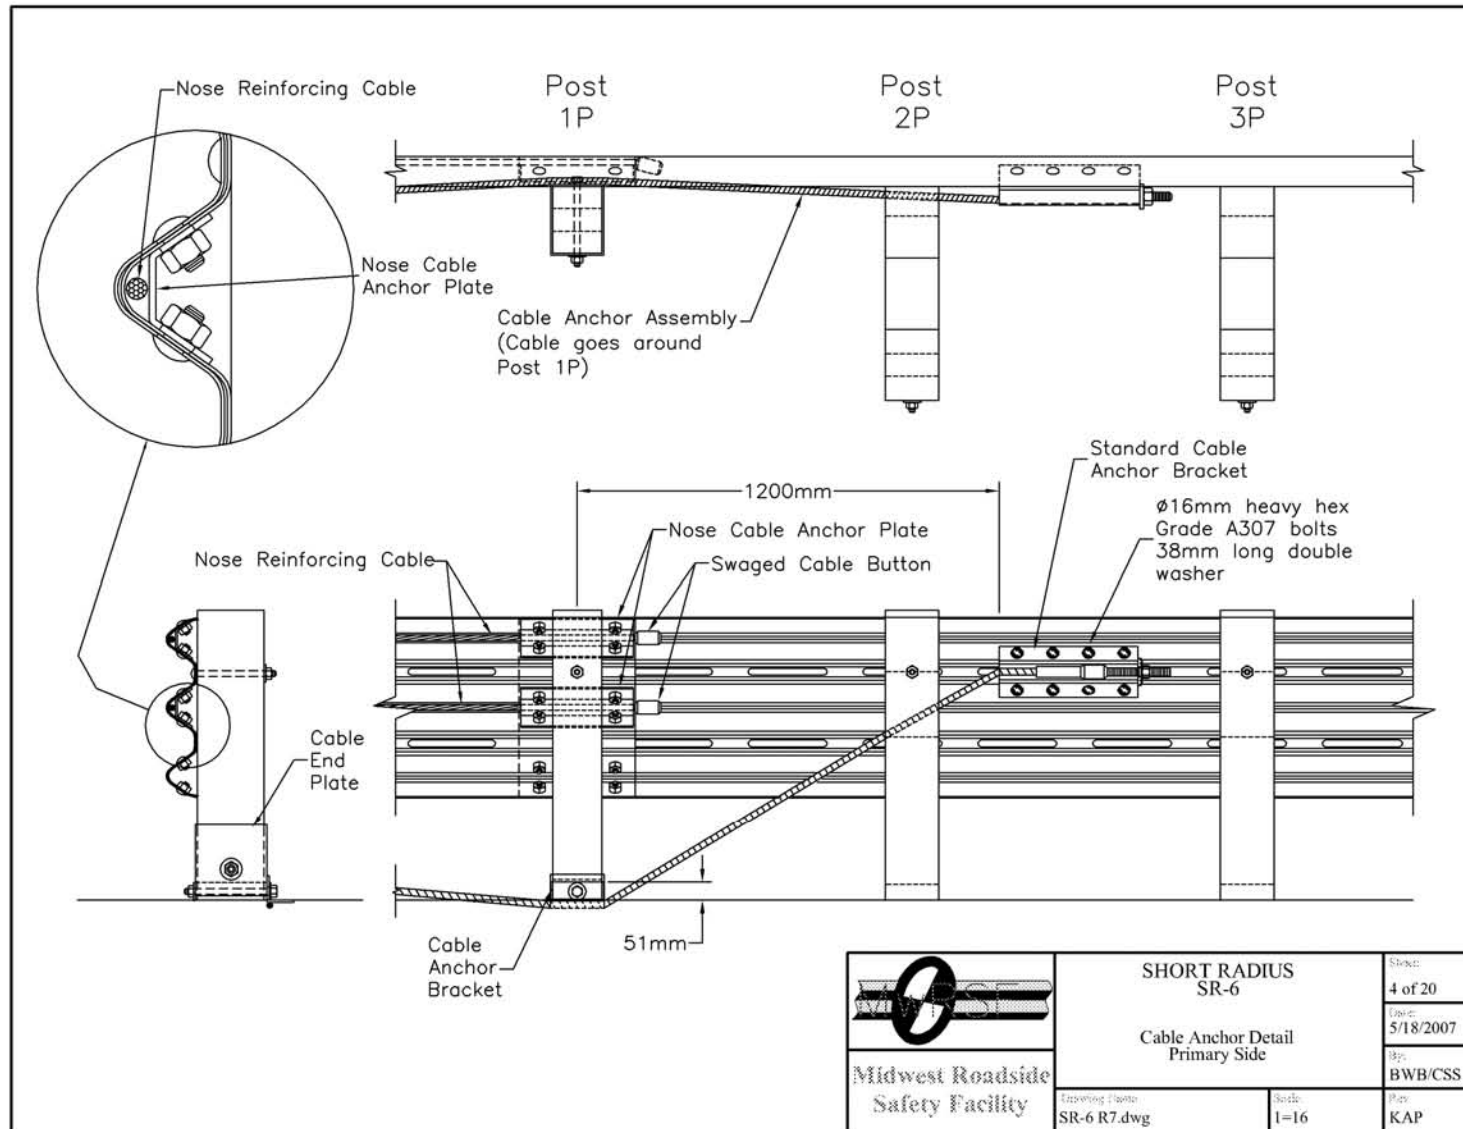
Primary Side Cable Anchor Detail, Test SR-6
